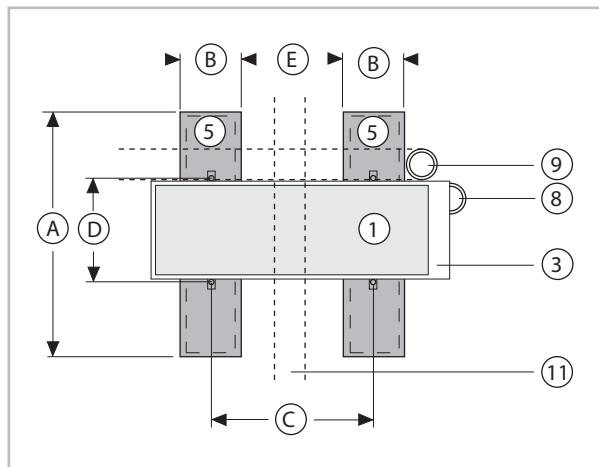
Dimensions for the strip foundation MVV 1200-1600 DC (bird's eye view)
